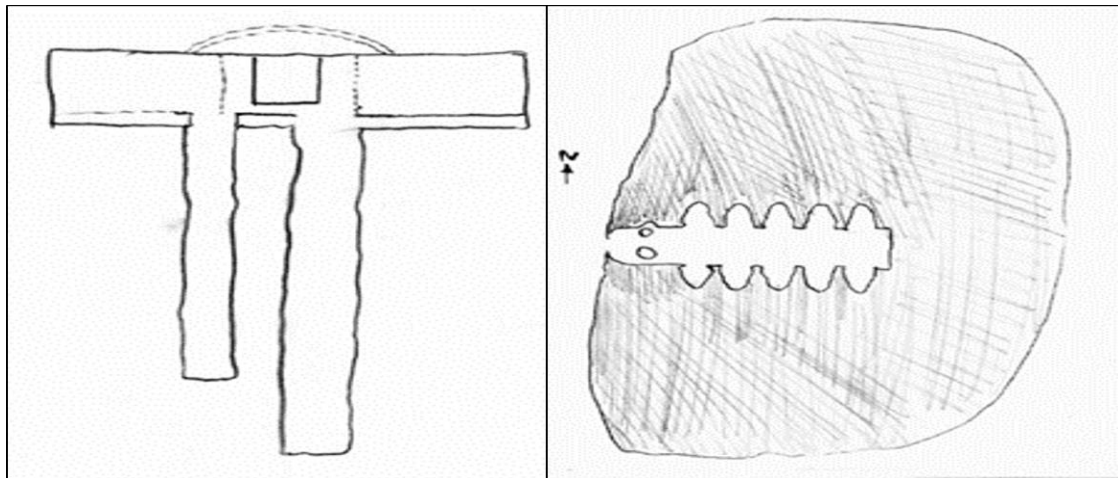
Plan and section of the building of Mehr Kadeh in Tabas (Drawing by Keshavarz Divkolaee, 2009).
